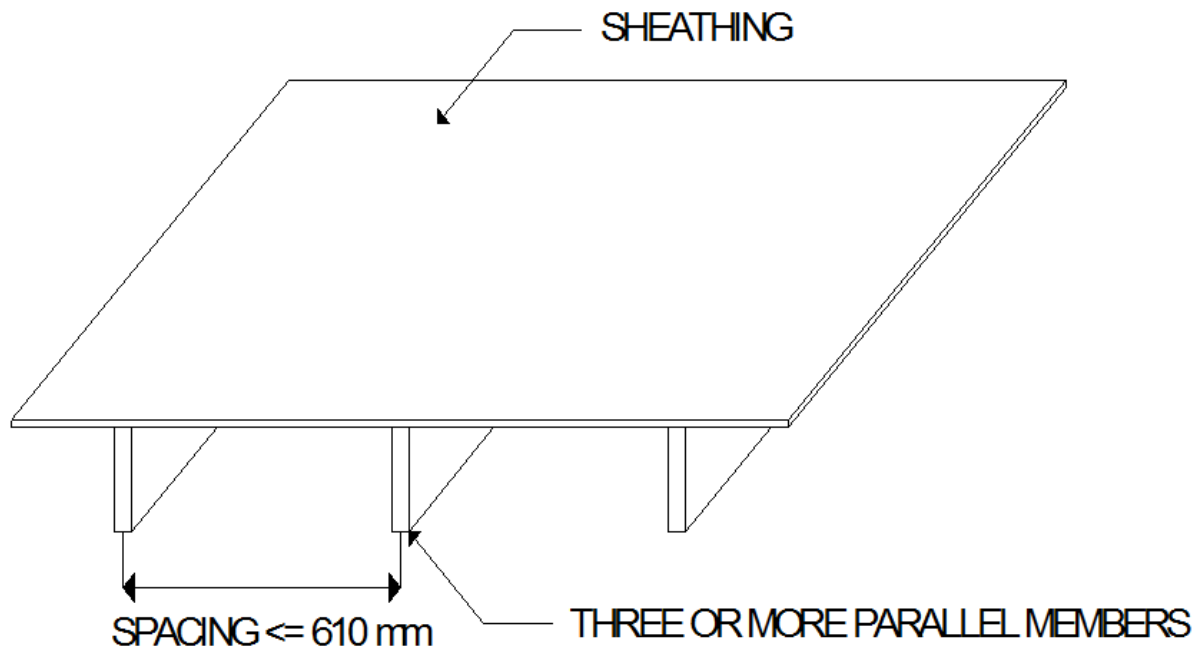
Typical Light Frame Wood Floor System with Sheathing Panel
